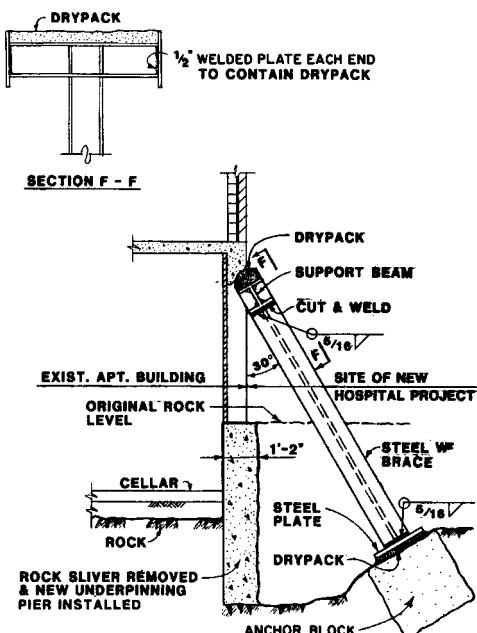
Emergency plan for underpinning existing building to create proper bearing.
